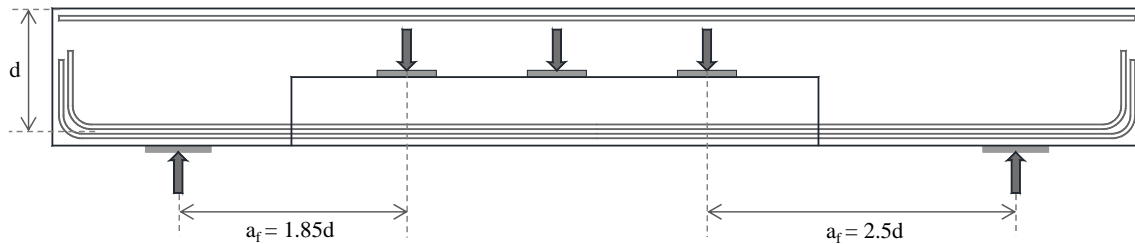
Typical specimen for TxDOT Project 0-6416
